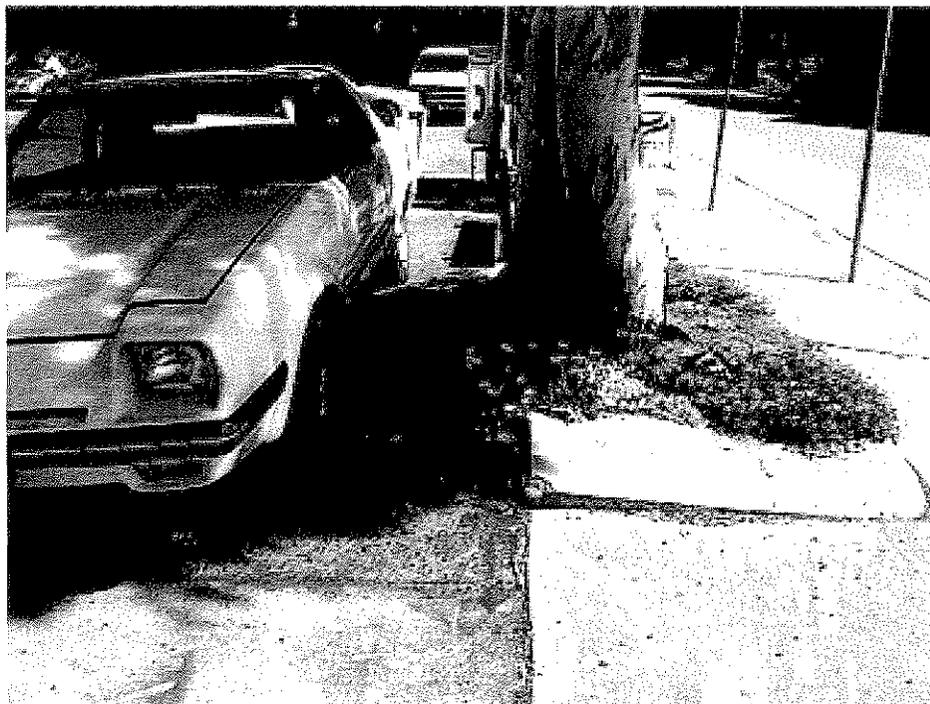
Same tree looking north. Although not shown, the asphalt damage ends 8' to the west side of the tree where proposed construction will occur.
